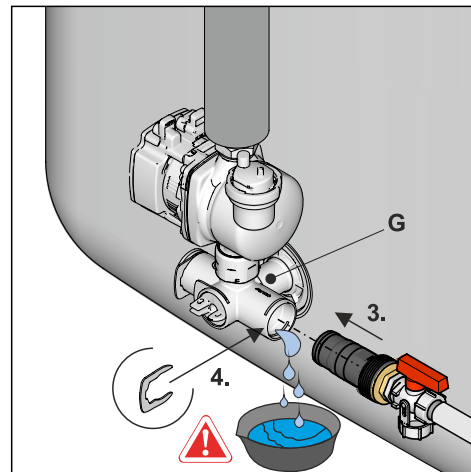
Installing the combined filling and draining filling connection in the connection bracket
